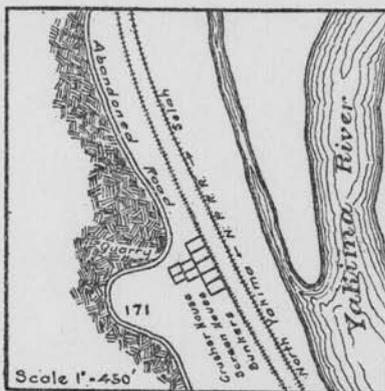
Plan of the Selah state quarry and crushing plant, near North Yakima.
